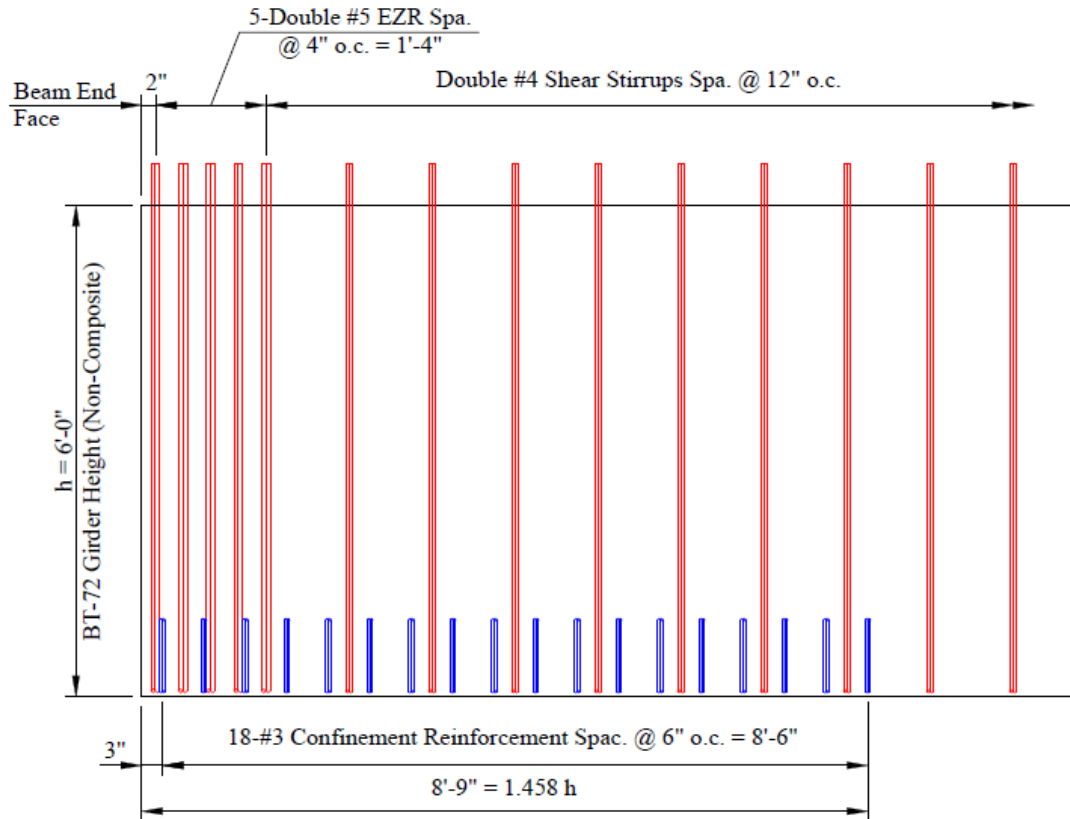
Typical elevation view of the BT-72 girders showing the spacing of the end zone reinforcement (EZR) as well as shear and confinement reinforcement in accordance with AASHTO LRFD Specifications.
